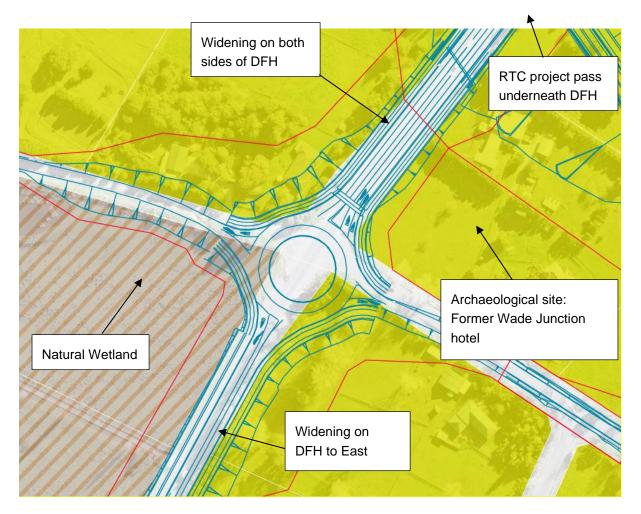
Constraints around the Dairy Flat Highway / Wilks Road intersection
